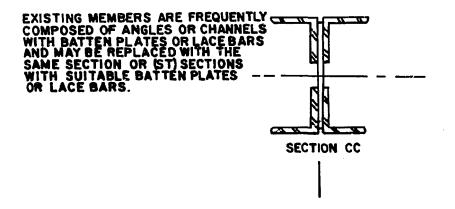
TYPICAL SECTIONS OF A VERTICAL TENSILE TRUSS MEMBER
